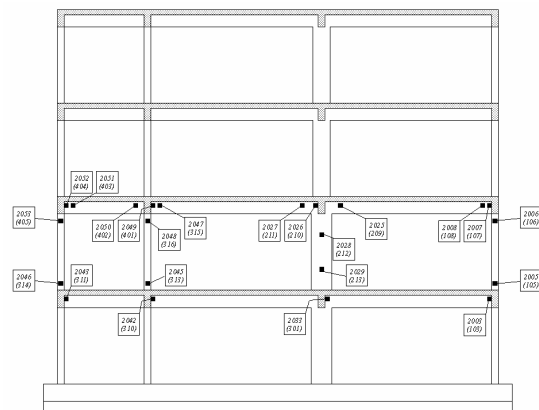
K-bracing test instrumentation: location of the 22 inclinometers
